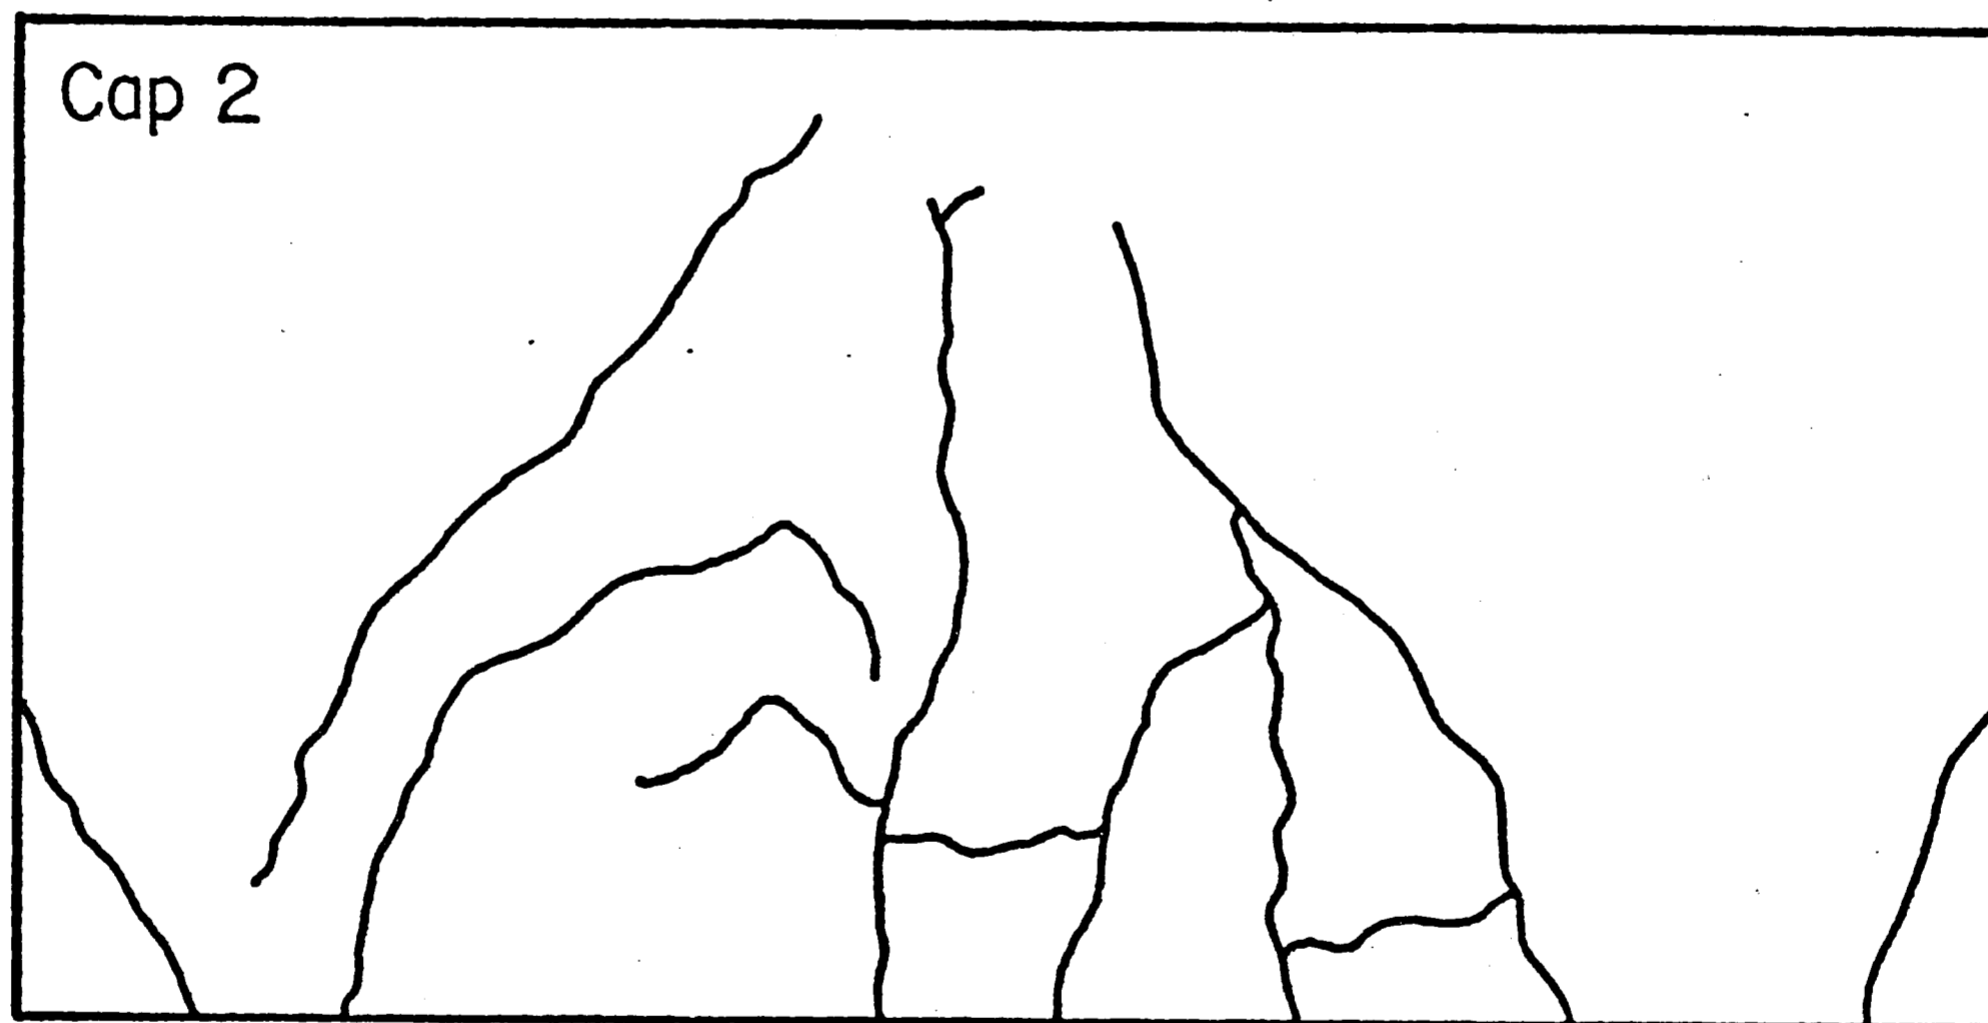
SOUTH FACE OF PILE CAP 2 - CRACK PATTERNS
